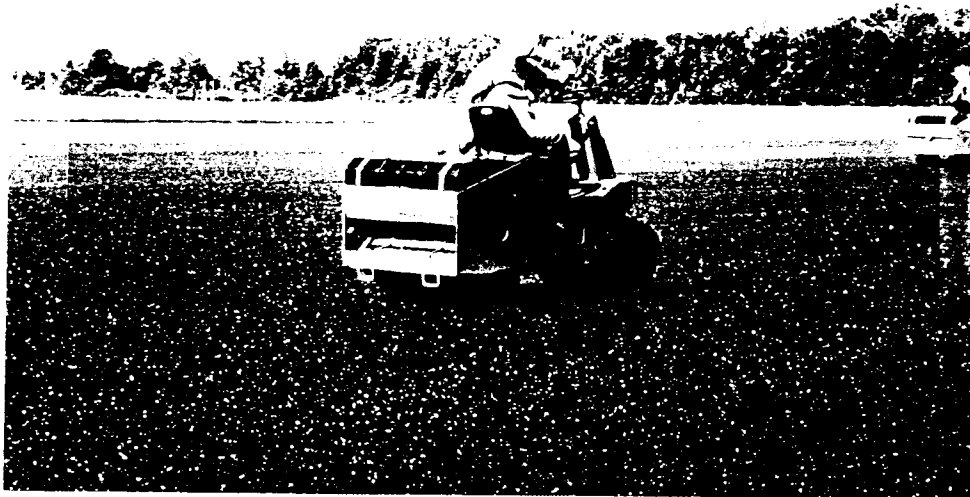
Typical view of rolling open-graded asphalt concrete with steel-wheel roller
